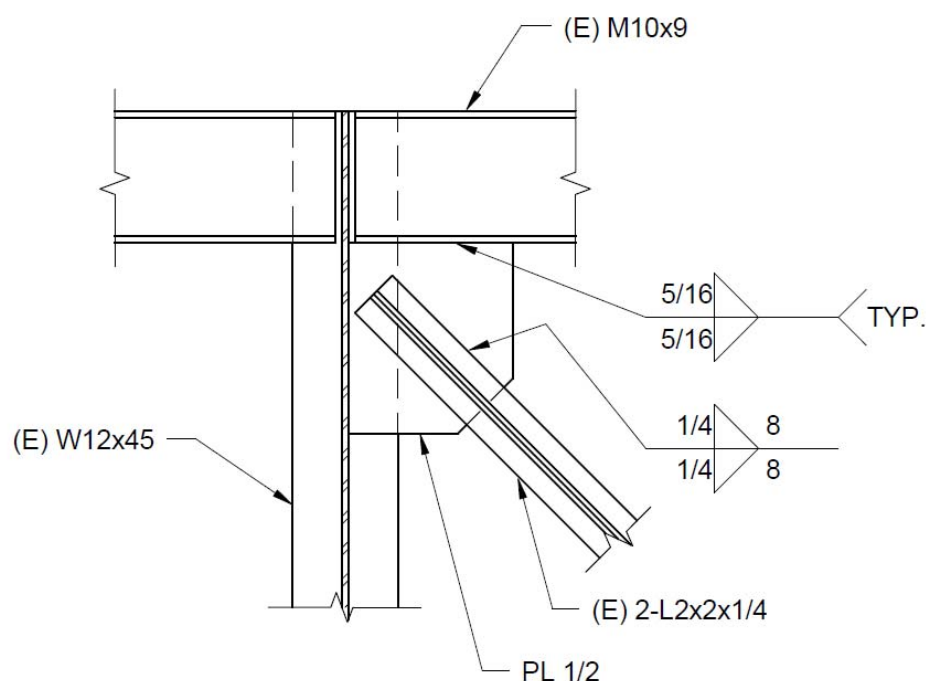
Strengthening of Tension Only Brace Connection at Roof
